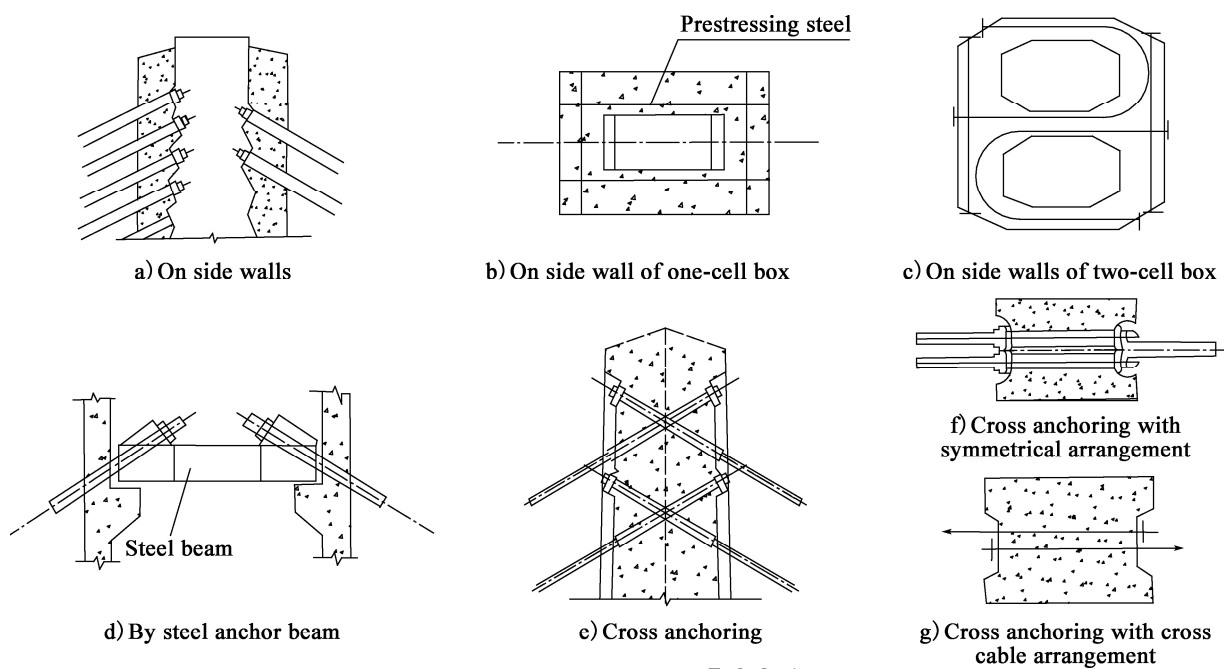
Fundamental forms of anchorages in concrete tower
